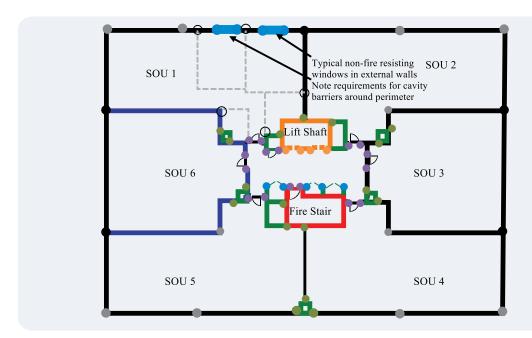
Floor plan section of an apartment building showing typical cavity barrier positions.
